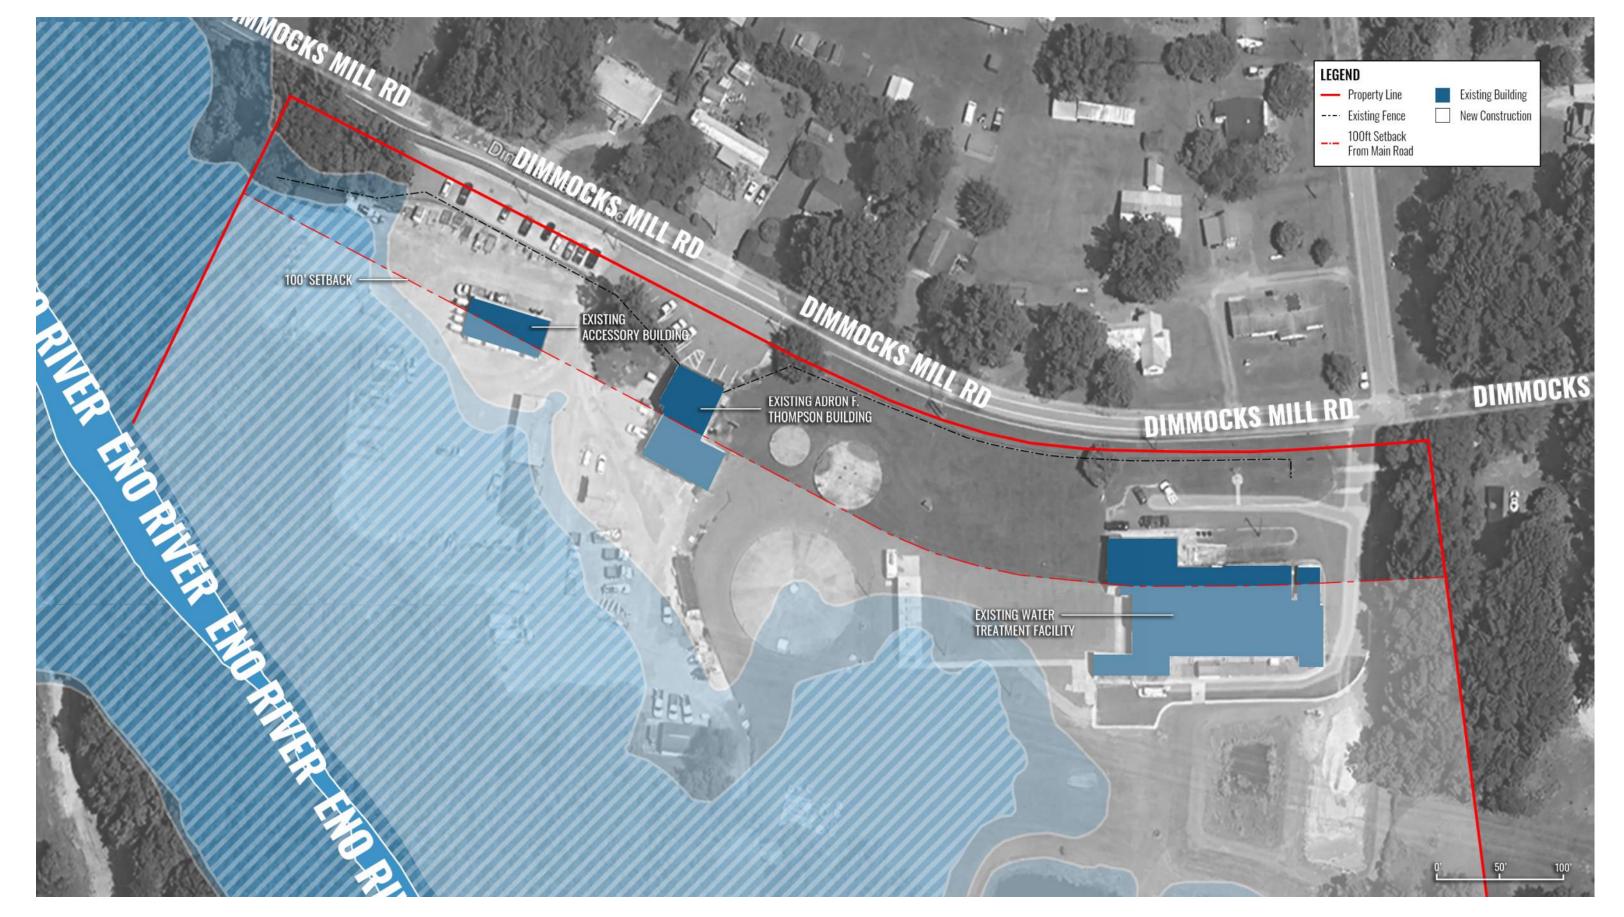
EXHIBIT B - All Existing Structures Are Closer Than 100' Setback Hillsborough Adron F. Thompson Facility - 2231.01
